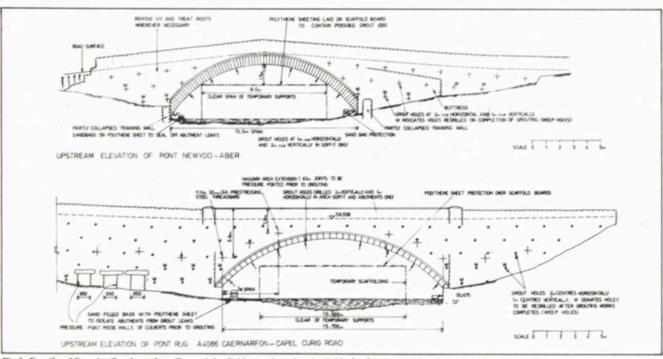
Details of Repairs Conducted on Two of the Bridges referred to in Table 1, above.
